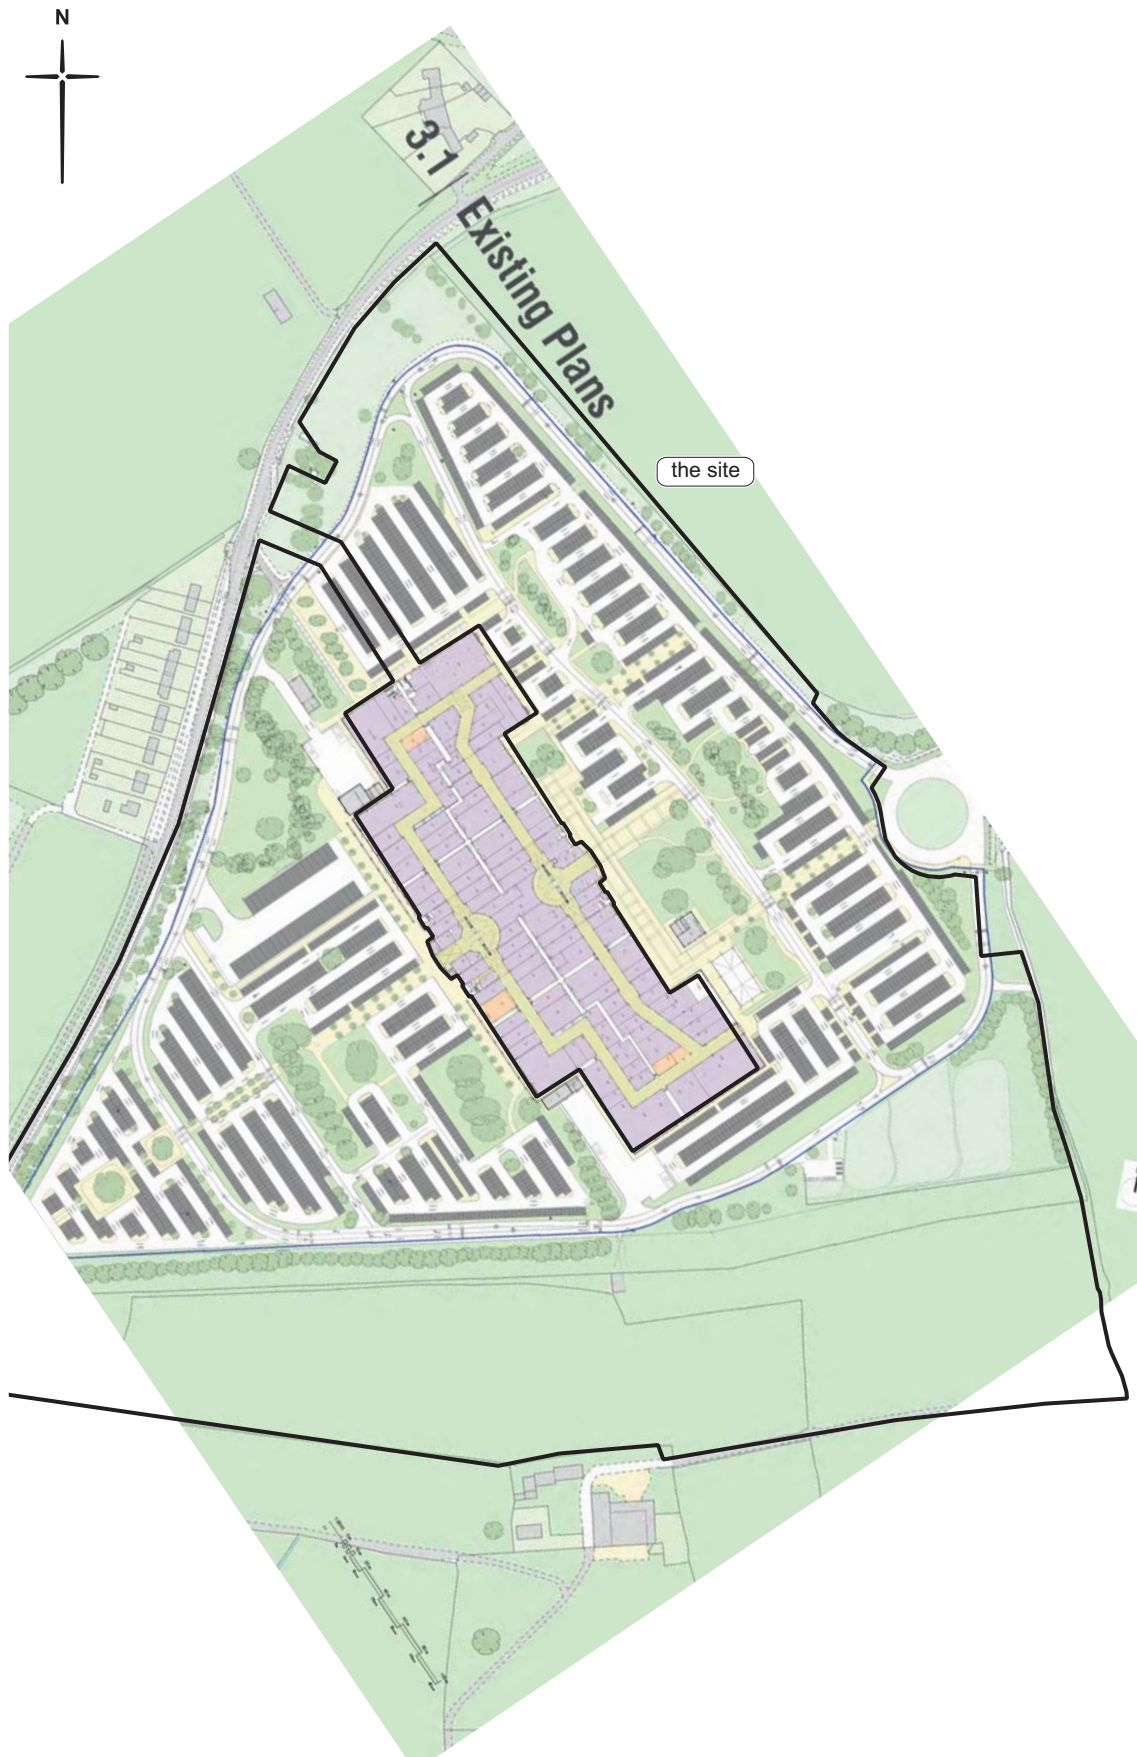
Existing site plan (Leonard Design Architects, Pre-App, April 2018)
